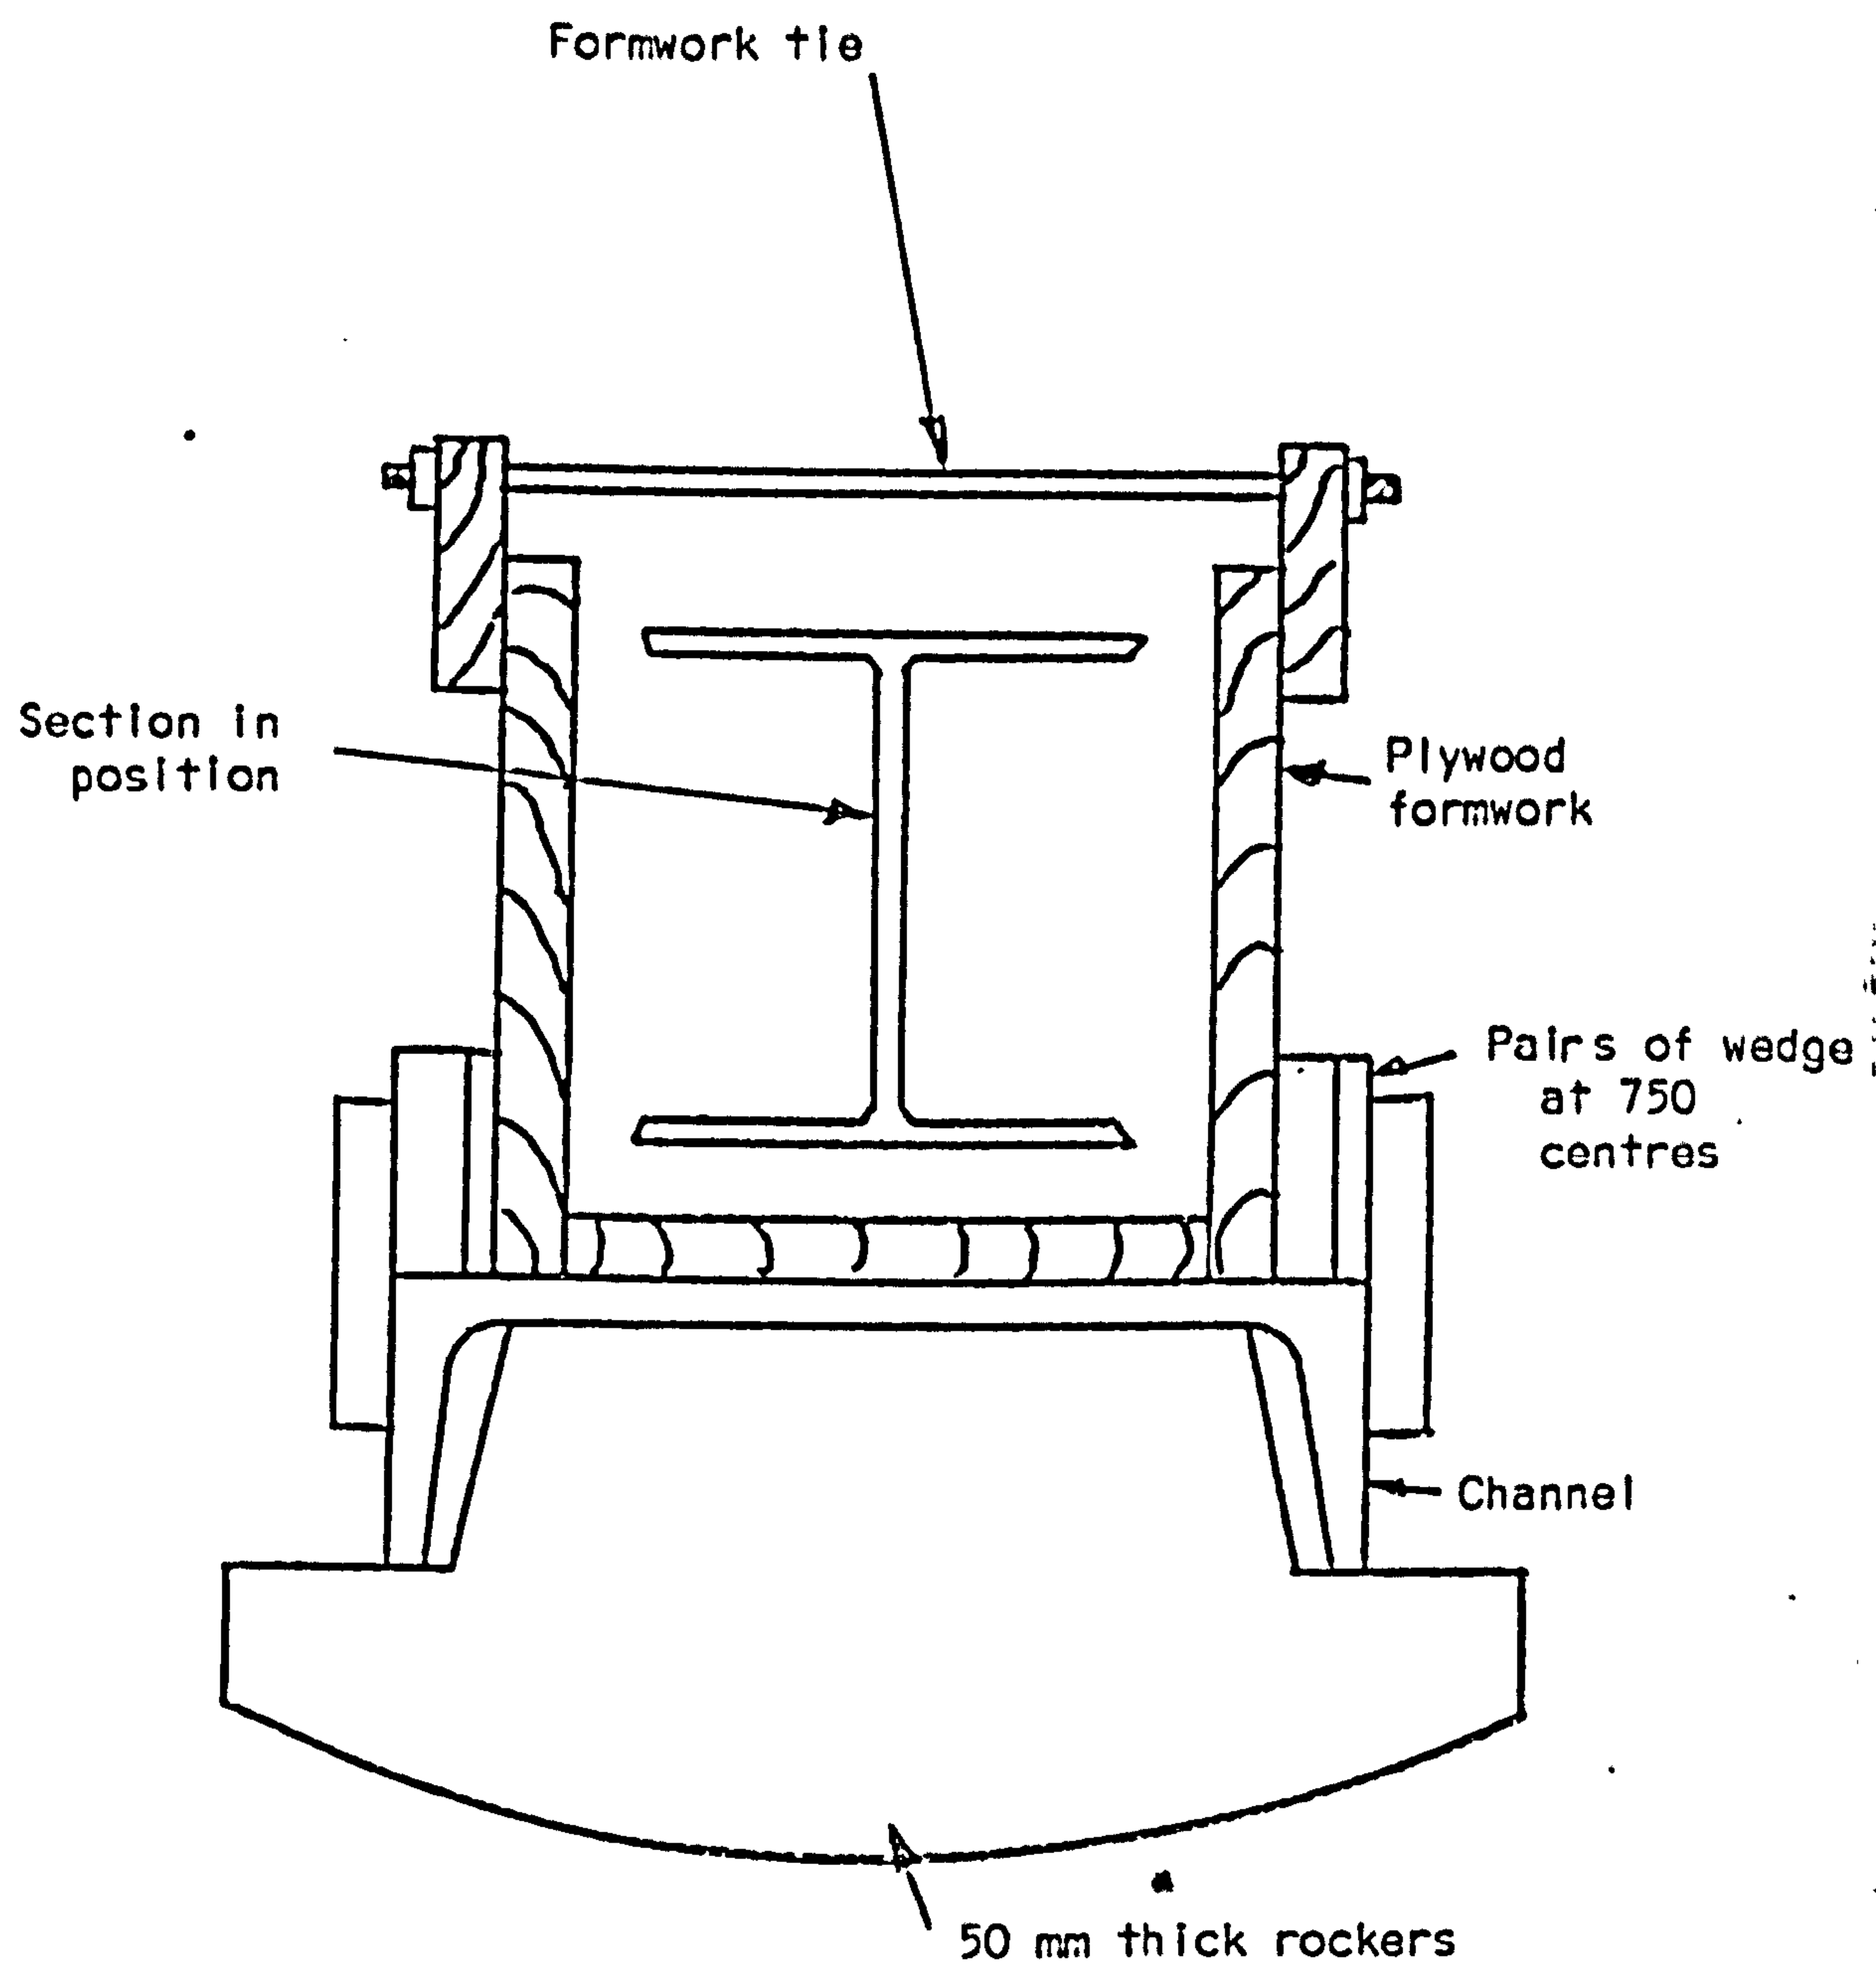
SECTION THROUGH FORMWORK AND STRONGBACK
